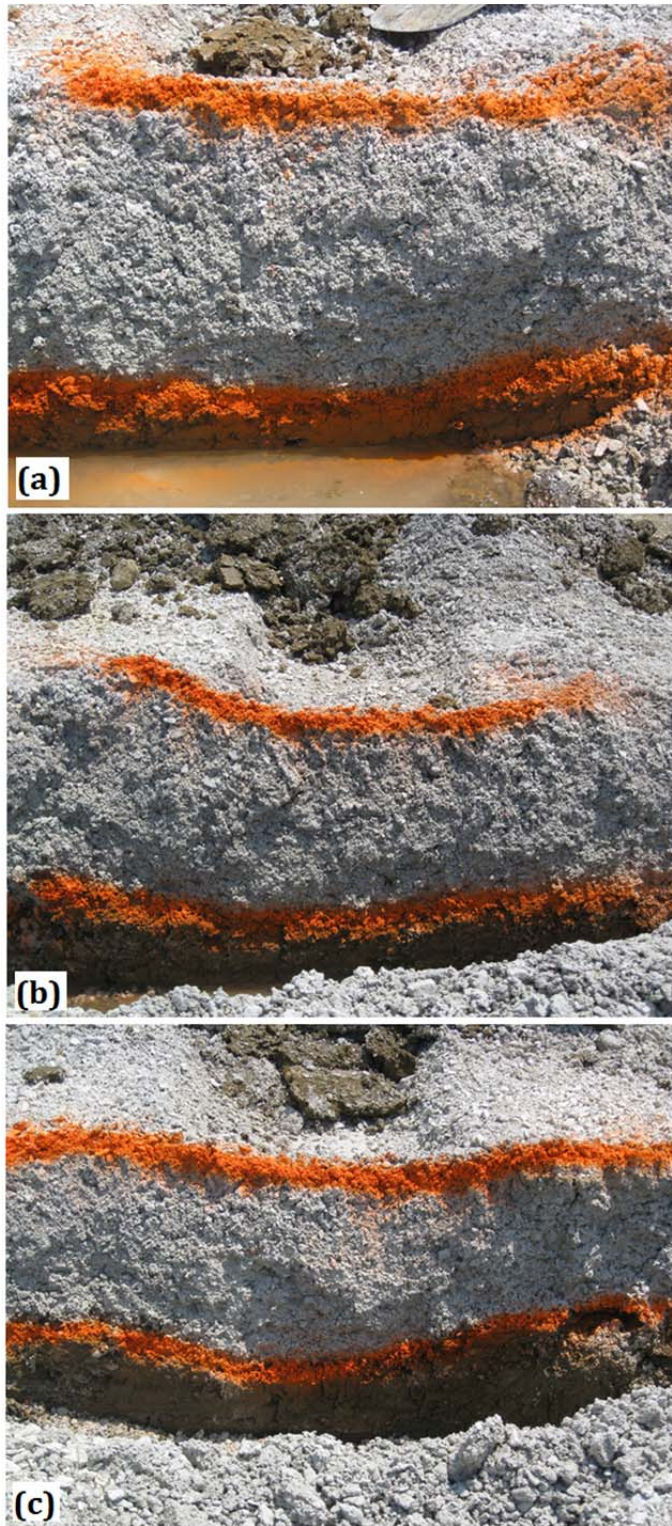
Excavated trench photos showing surface and base-subgrade interface deformations in test sections (a) 1, (b) 2, and (c) 3 for Cell 3 due to loading under flooded conditions
